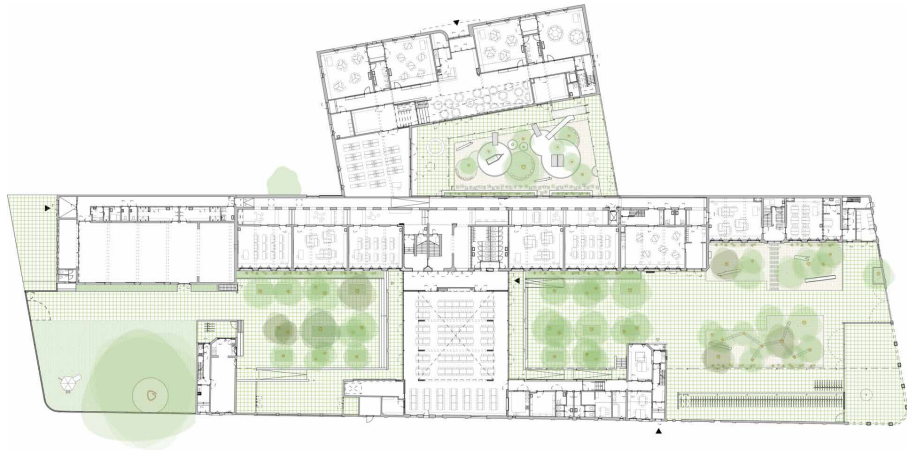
Floorplan of the Basisschool Edison. Source: KSA
